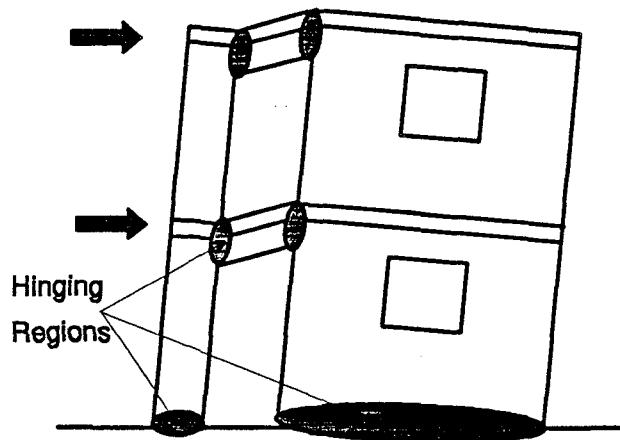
Collapse mechanism of "Coupled wall-based" design philosophy (Specimen 1b).
